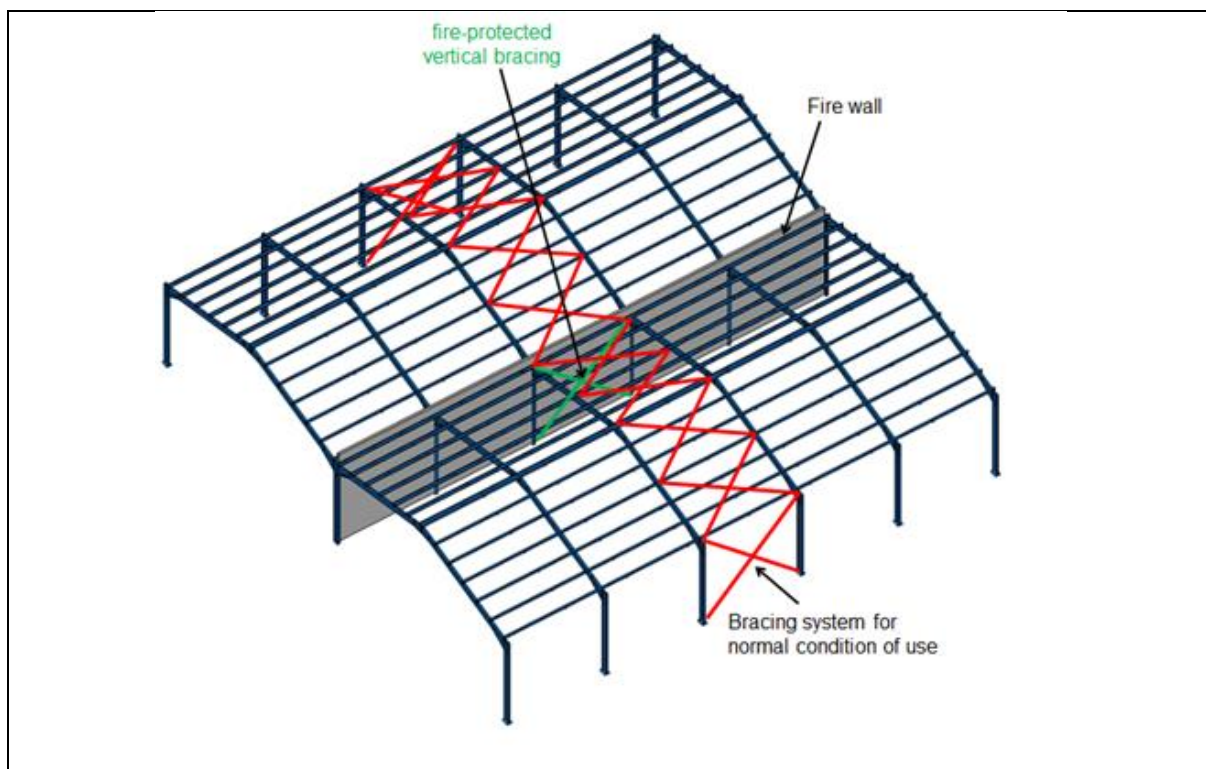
Recommendations for bracing systems – wall perpendicular to portal frames
